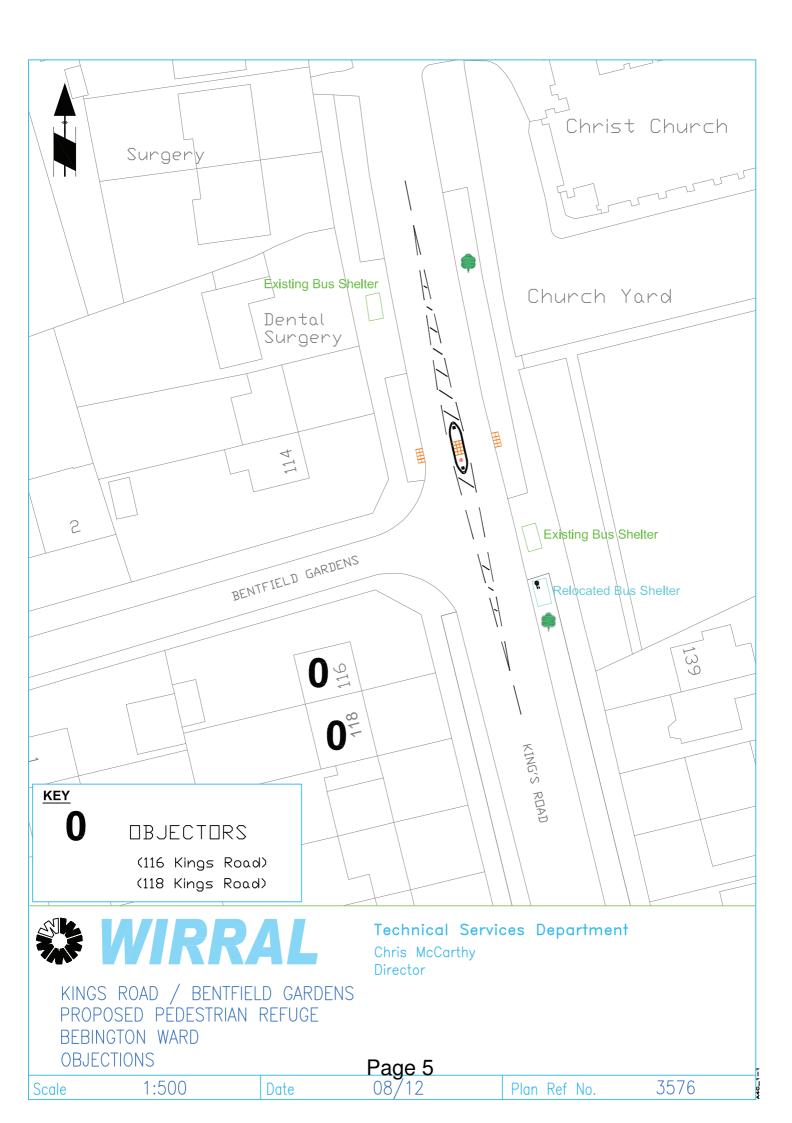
indicating the proposed layout of the Pedestrian Refuge Island.
